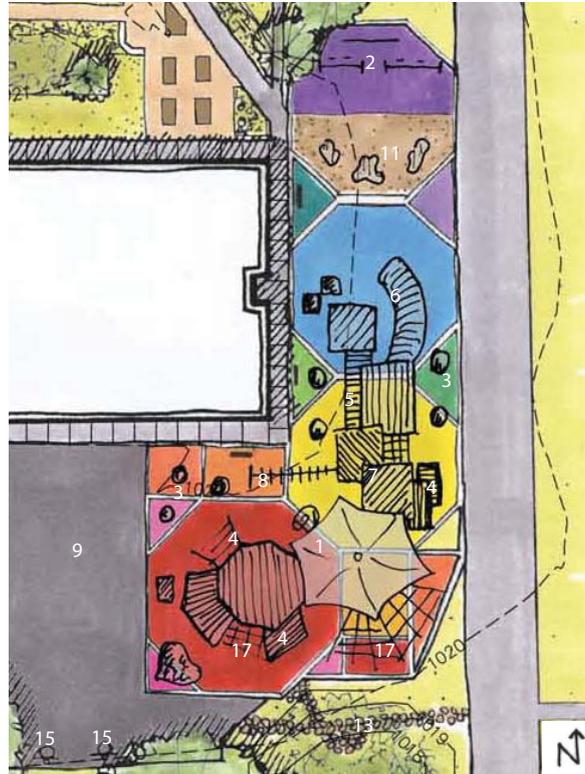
Enlarged Plan of East Playground. Not to Scale. Plan by Author
